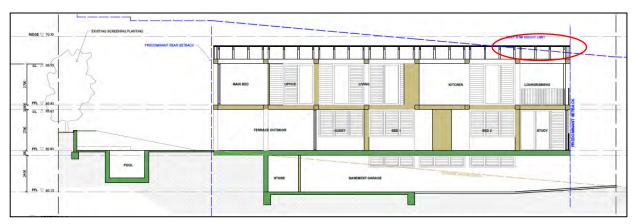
Section A-A showing portion of the development which exceeds height. (Source: Clinton Murray Architects, 2023)
